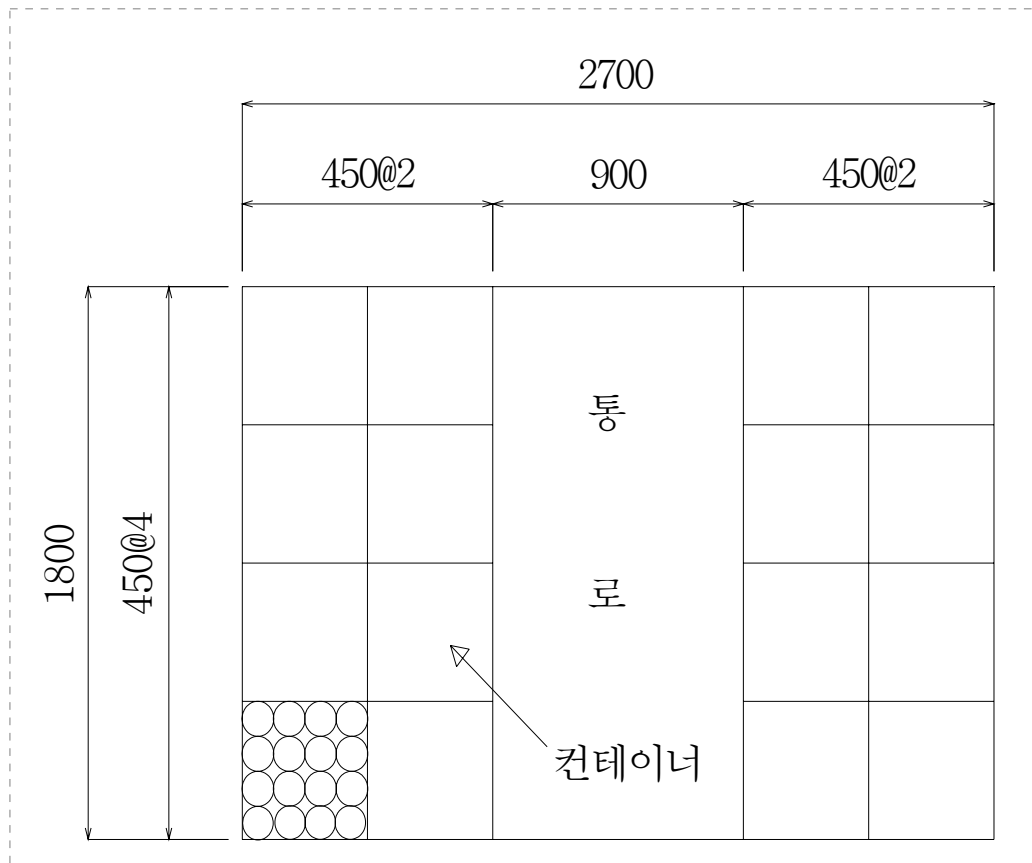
Plan of *Eryngii* cultivation house(unit : mm).
